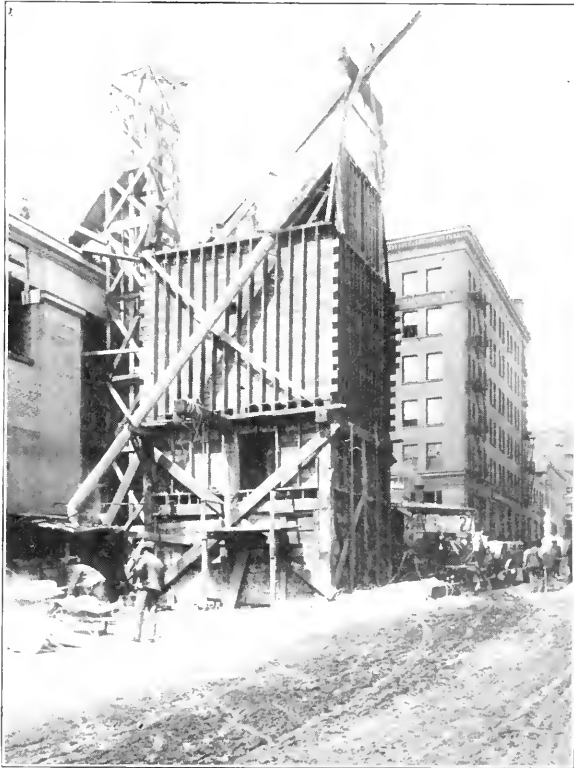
Mixing Plant, Lindeke-Warner Building, St. Paul.
